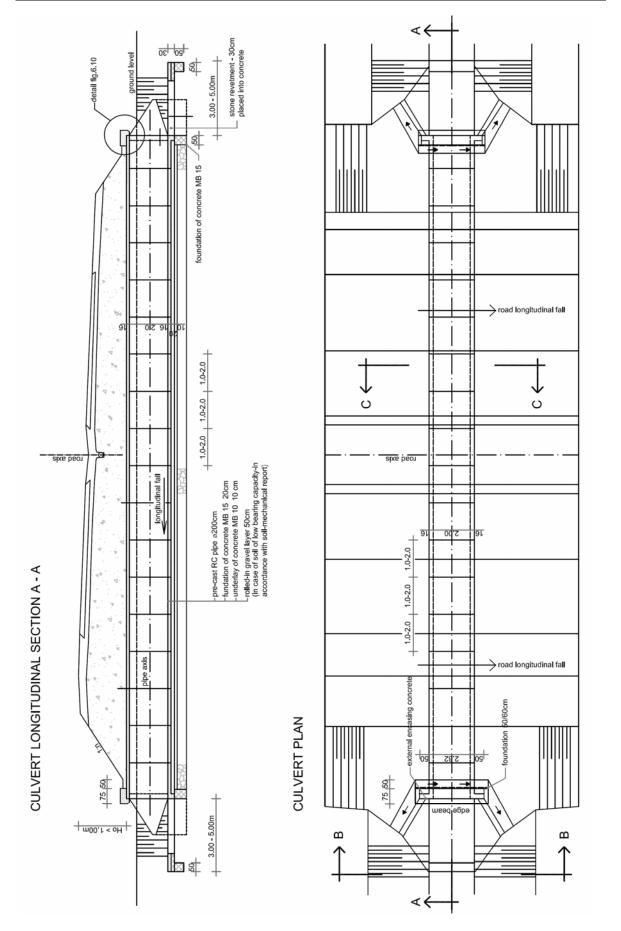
Plan and longitudinal section of pipe culvert with openings of  $\emptyset$  200 cm
